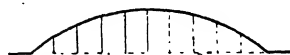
Carpet Planner's Circular Window or Recess Plan.
